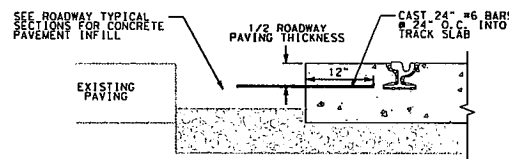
TRACK SLAB ADJ. TO EX. CONC. PAVING
